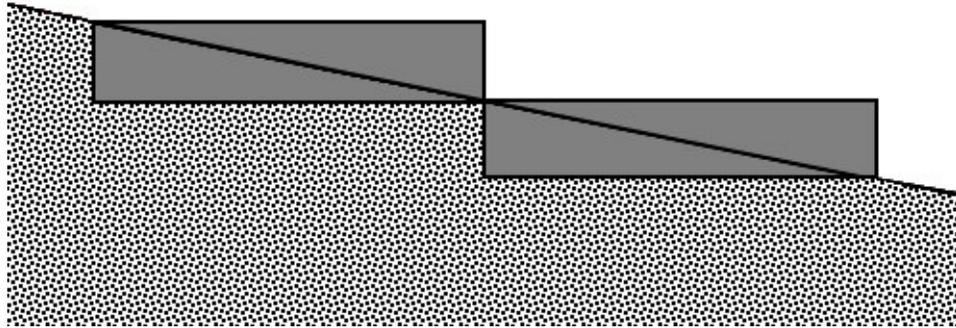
Example of a Site with a Steep Slope for Raised Garden Beds.
